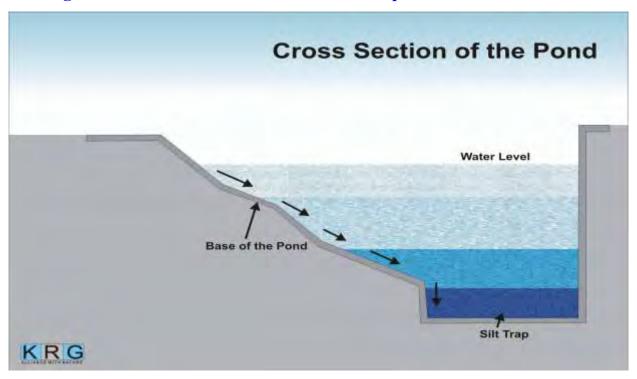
Cross Section of Pond with Slope towards the Outlet Side
